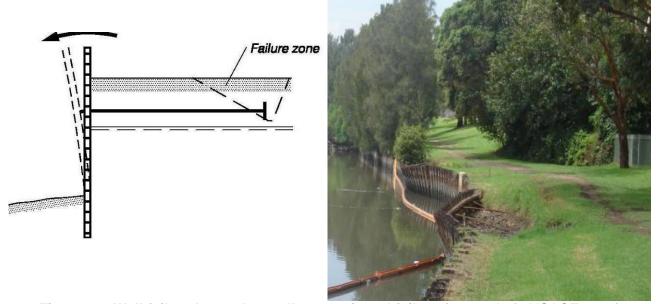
Wall failure by anchor pull-out or tie rod failure (source Left: USACE 2011)
